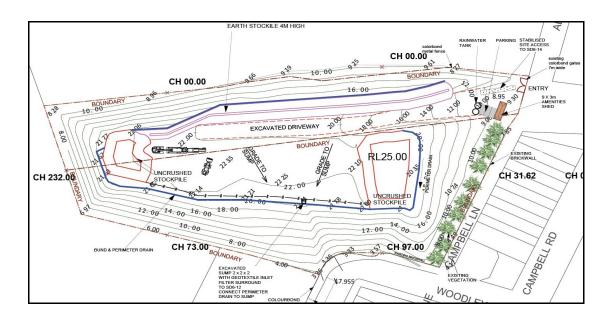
Extract from the Site Preparation plan for the initial stage of the proposed development. Full details are provided on Drawing No.06, Issue D of the plans of the proposed development at Appendix 9.
